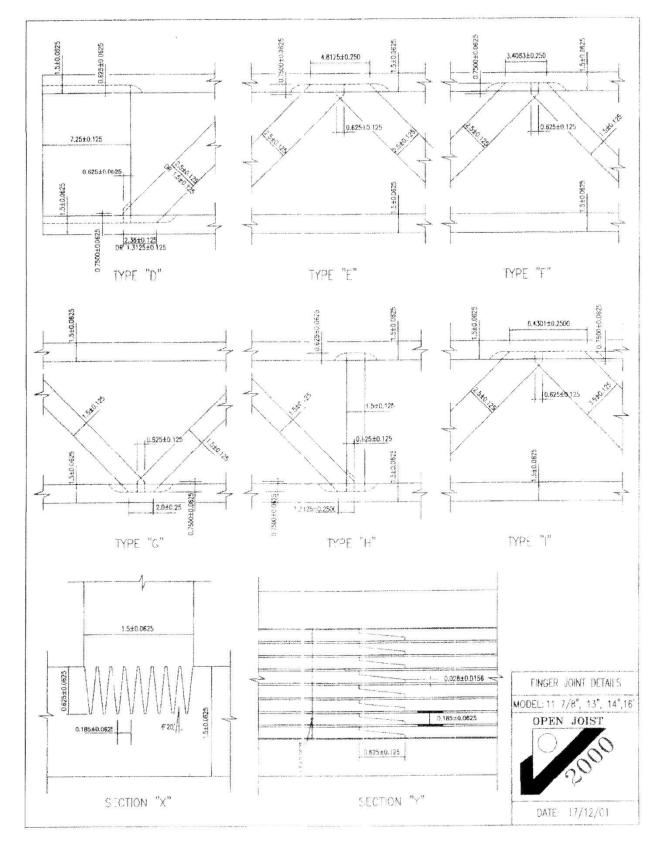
TYPICAL TRUSS DETAILS (Continued)
